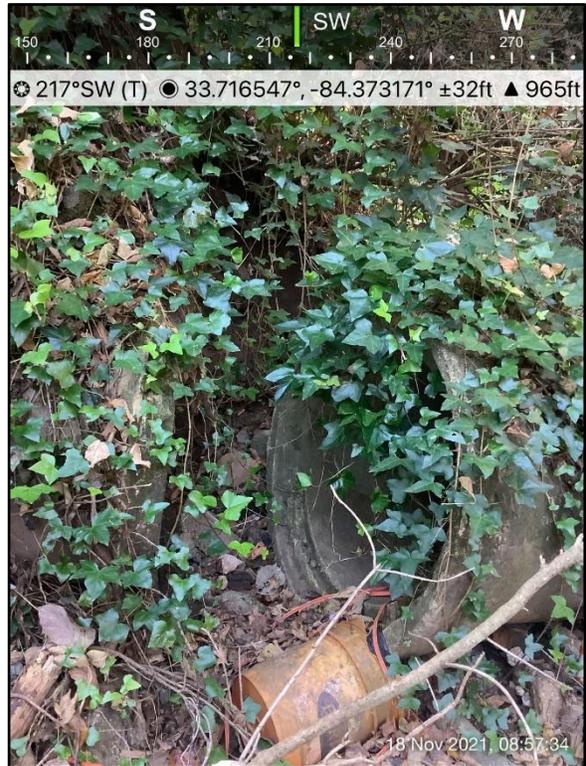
Erosional drainage feature adjacent to abandoned culvert structure looking upstream along Stream 1
